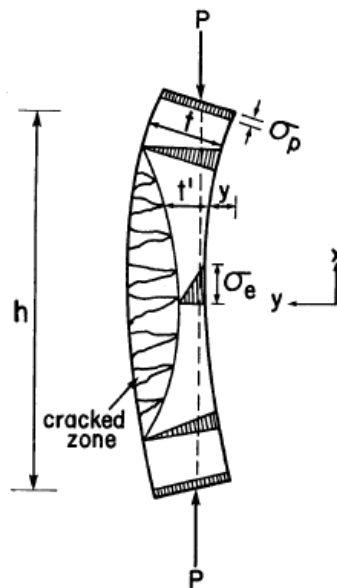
Deflected shape of an eccentrically loaded unreinforced wall (Hatzinikolas et al., 1978).
